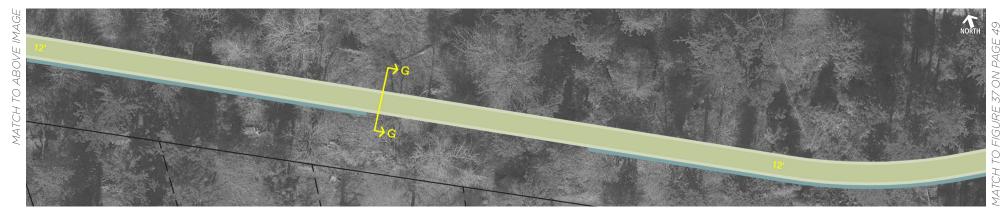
Trail makes a trail connection at 164th Ave SE in undeveloped WSDOT right-of-way and continues east.
